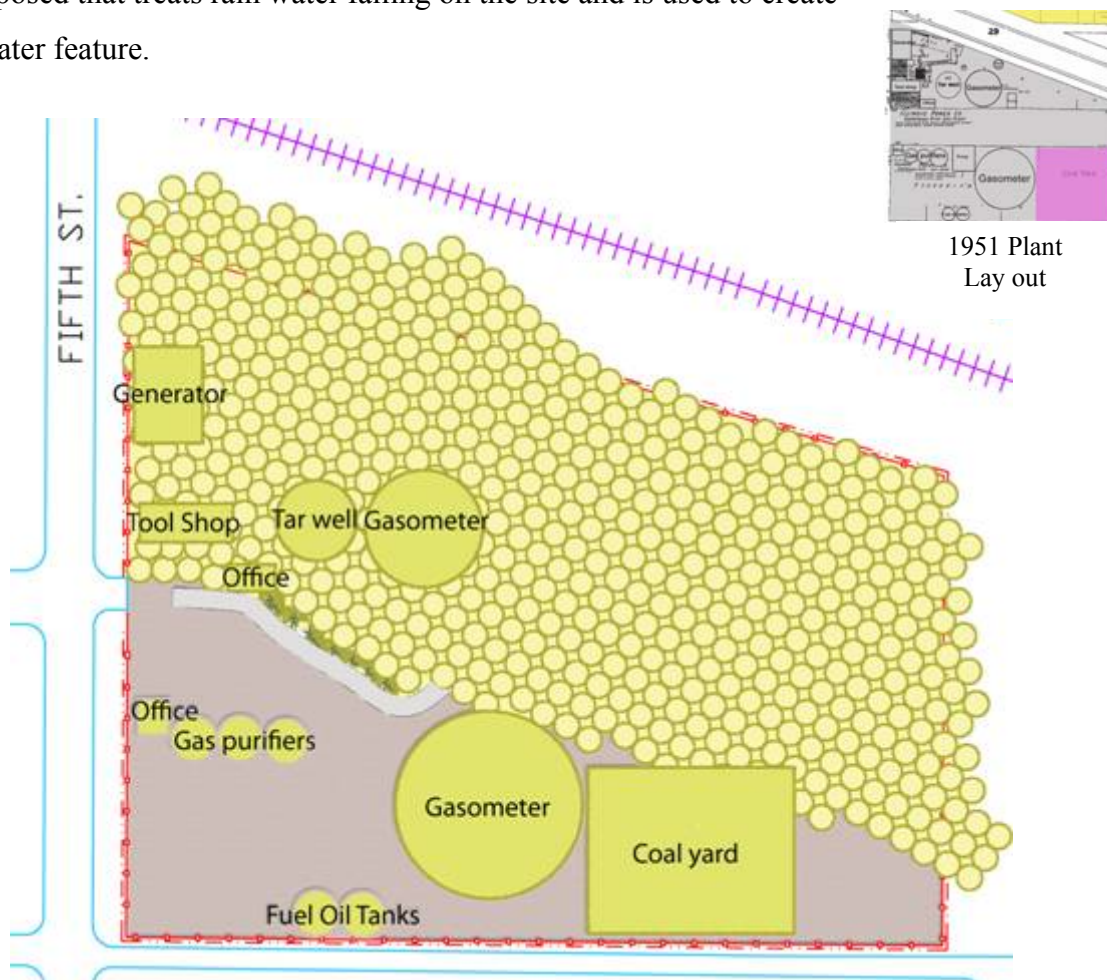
Stabilization / Solidification design showing footprint. A foot print of the MGP as in 1951 is recreated. A concrete ramp is used to access the piers after remediation. From the footprint, only the gasometer would be rebuilt to create a place for gathering and social interaction.
